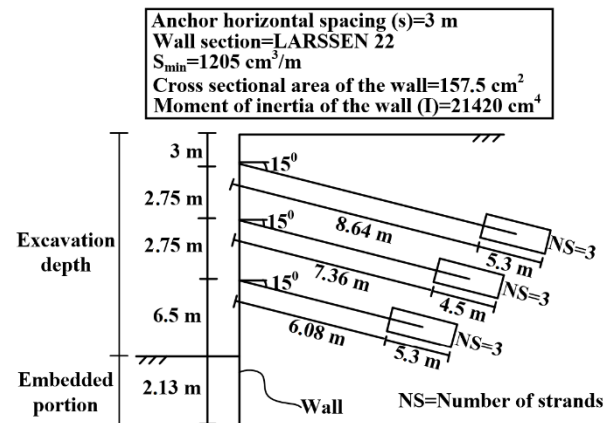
Wall geometry having the lowest cost for 20 m excavation depth
